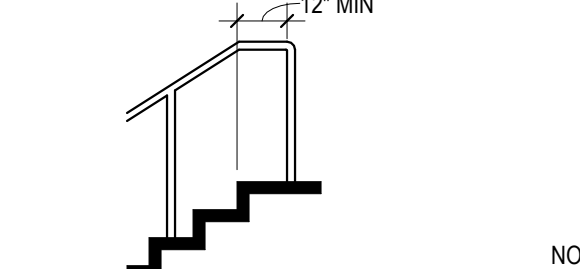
TOP HANDRAIL EXTENSION AT STAIRS
